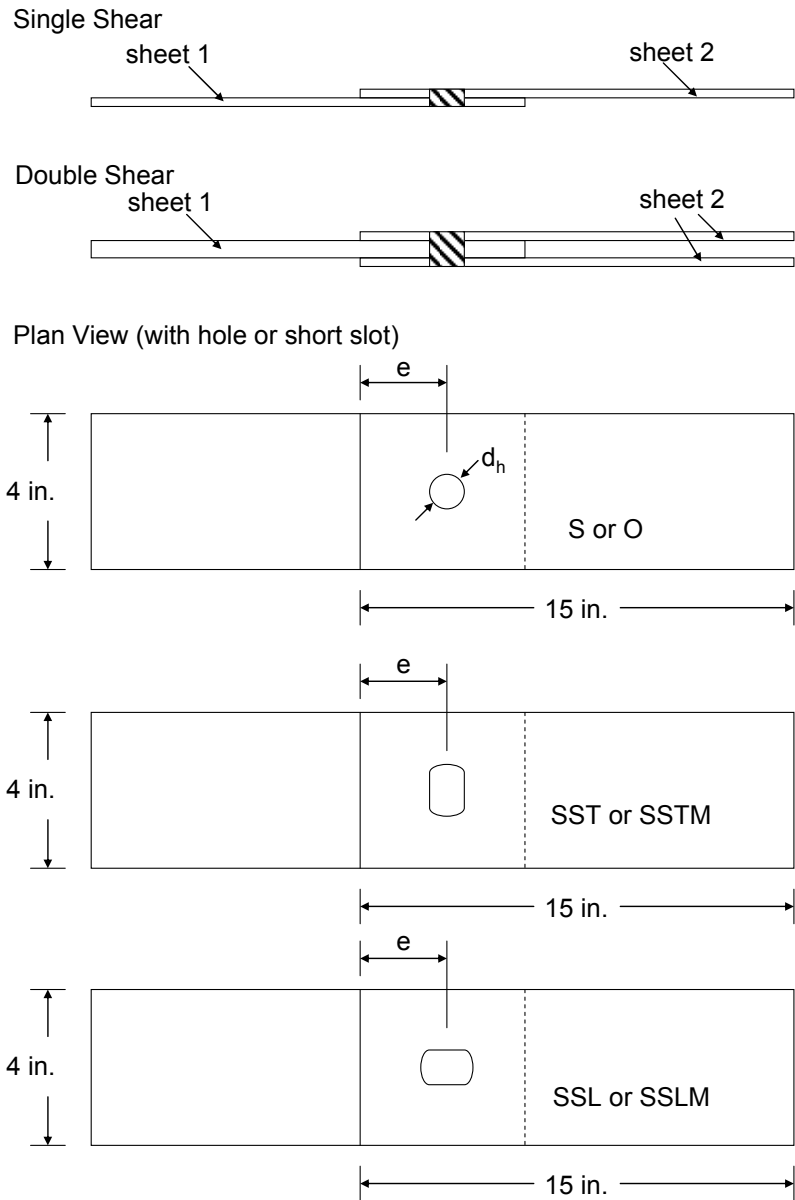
Dimensions of Specimens with One Bolt for Bearing and Shear Failure
